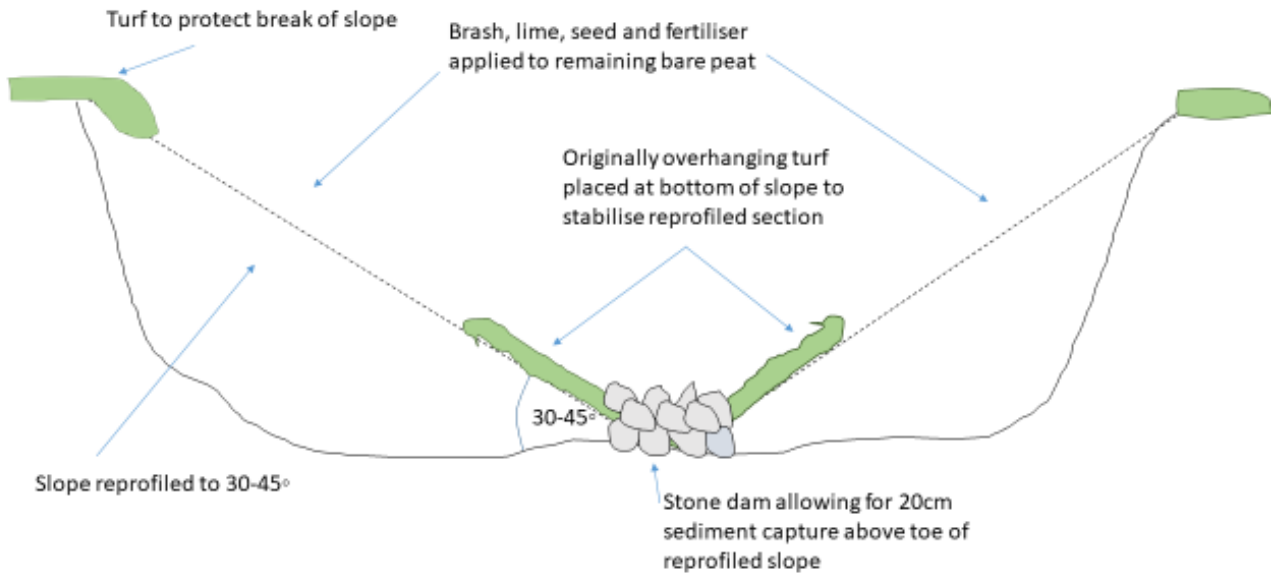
After reprofiling - both sides reprofiled and stone dam constructed
